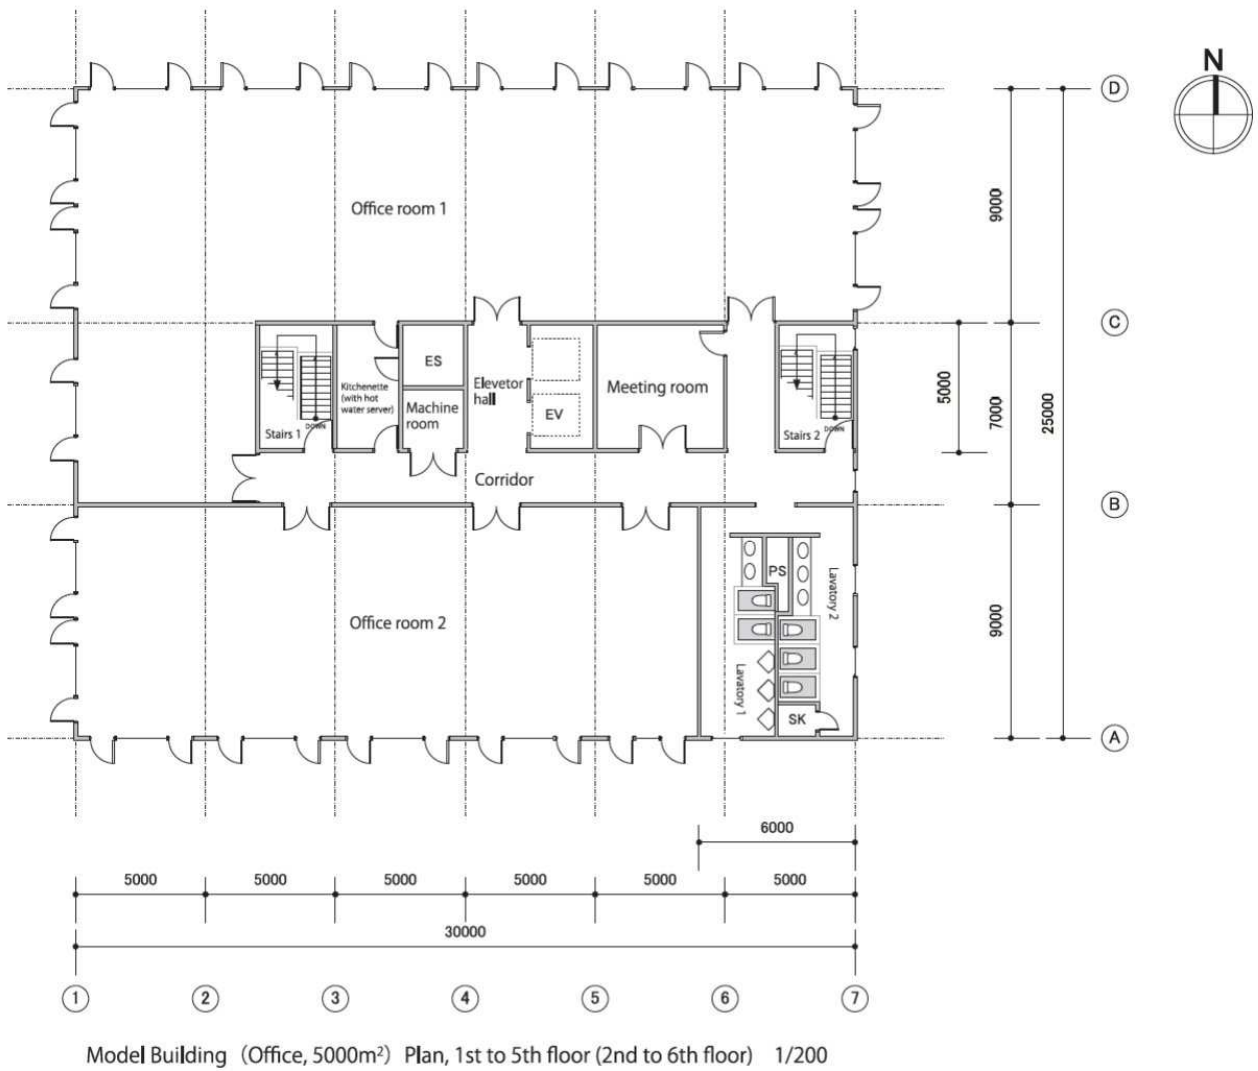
Model building (office, 5 000 m²) plan, 1st to 5th floor (2nd to 6th floor) 1/200
